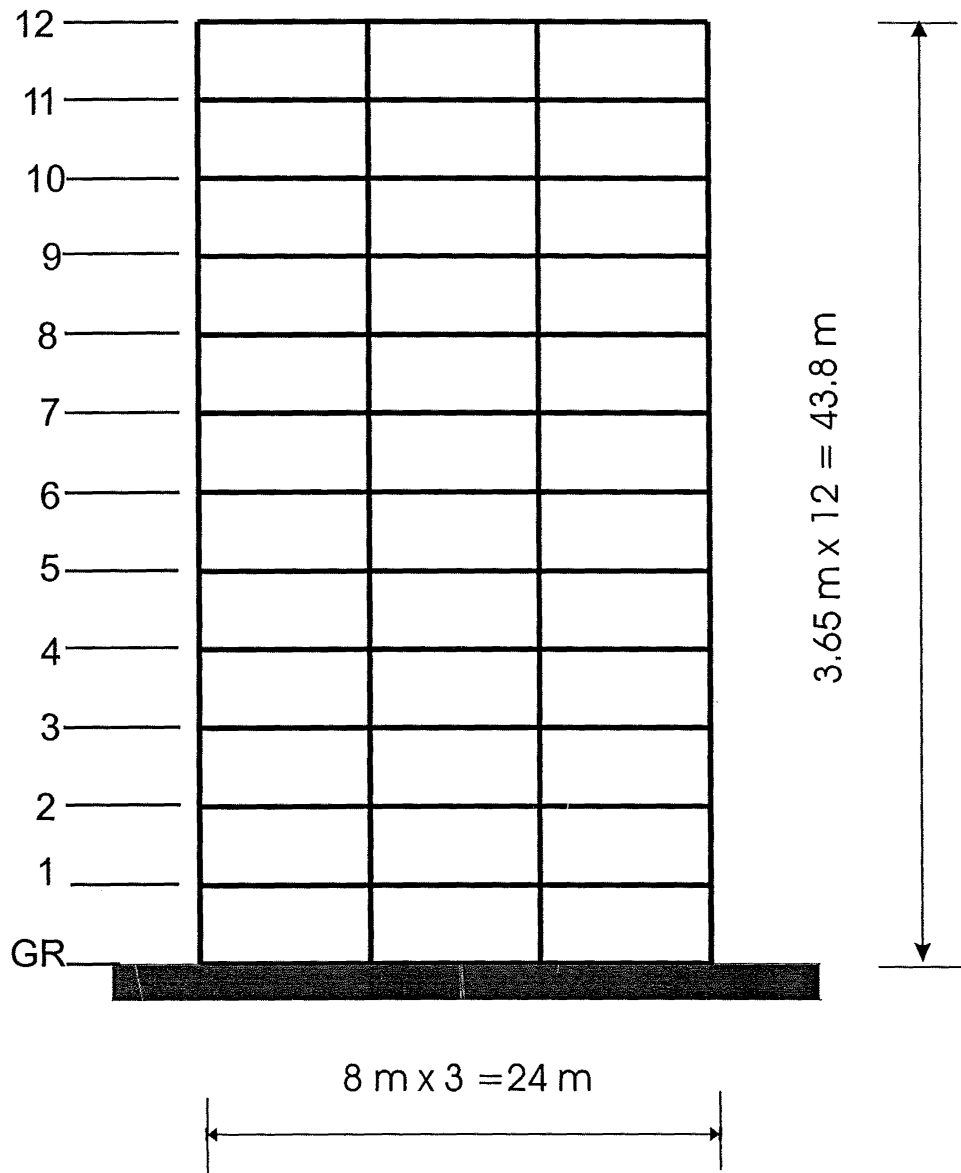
A 12-storey 3-bay reinforced concrete frame structure
